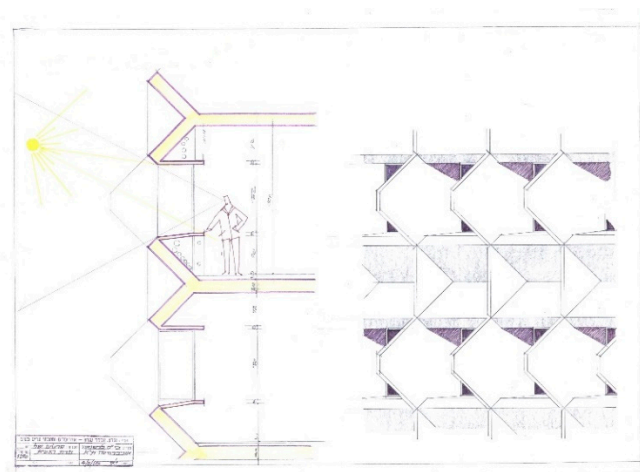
Arieh and Eldar Sharon, Sackler faculty: main façade details: section and elevation, 1:20, 4.8.68.
